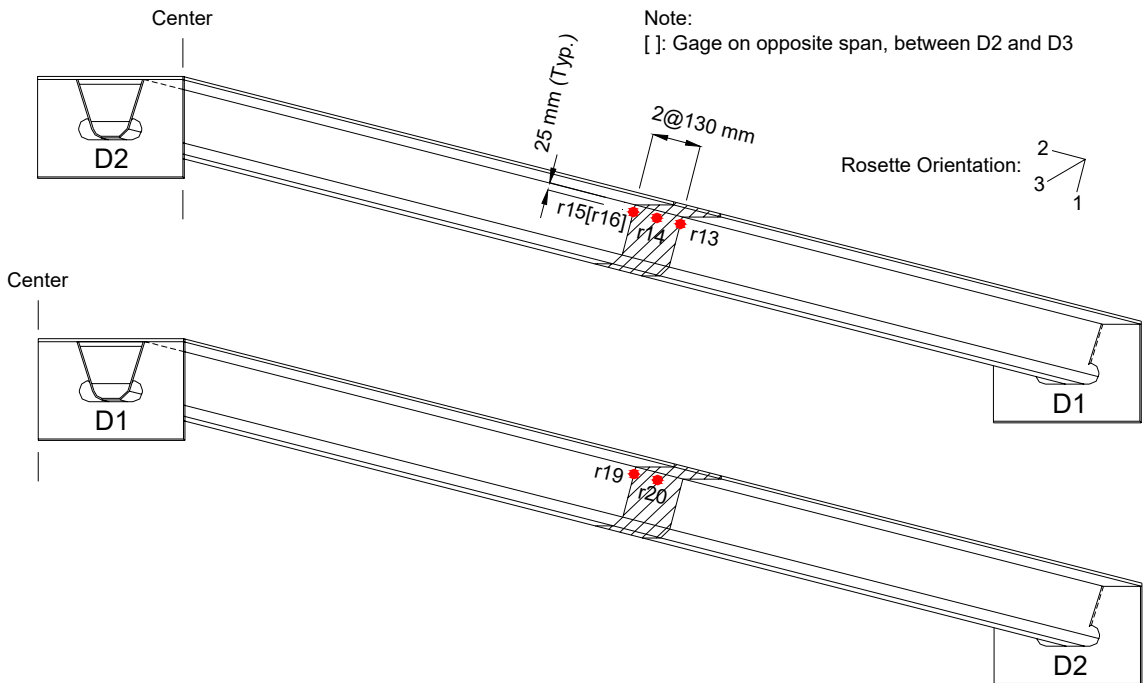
Specimen 6: Strain Gages in Outer Surface of Rib R3 Near Rib-to-Deck Welds
